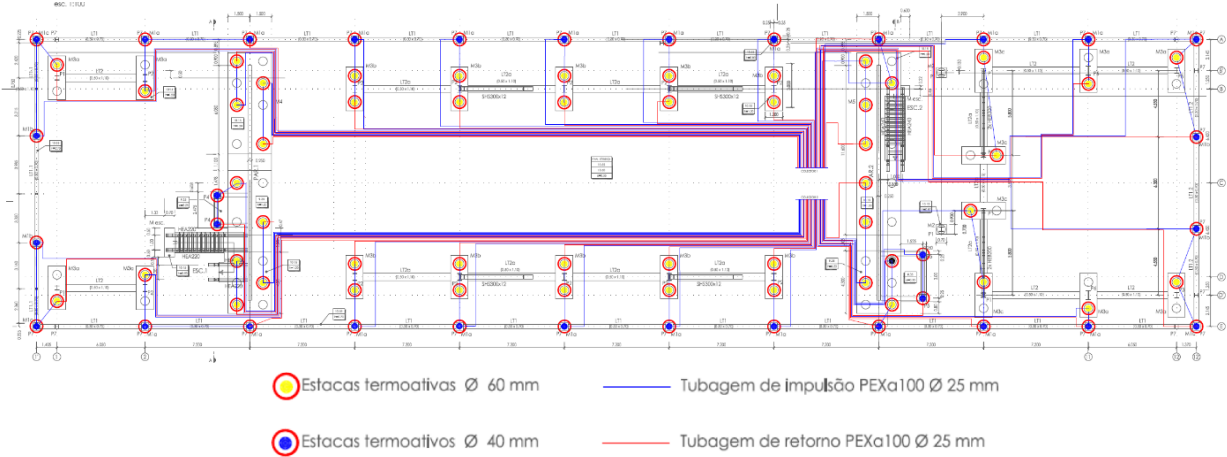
CICFANO's building foundation and hydraulic network schematics (no scale)
